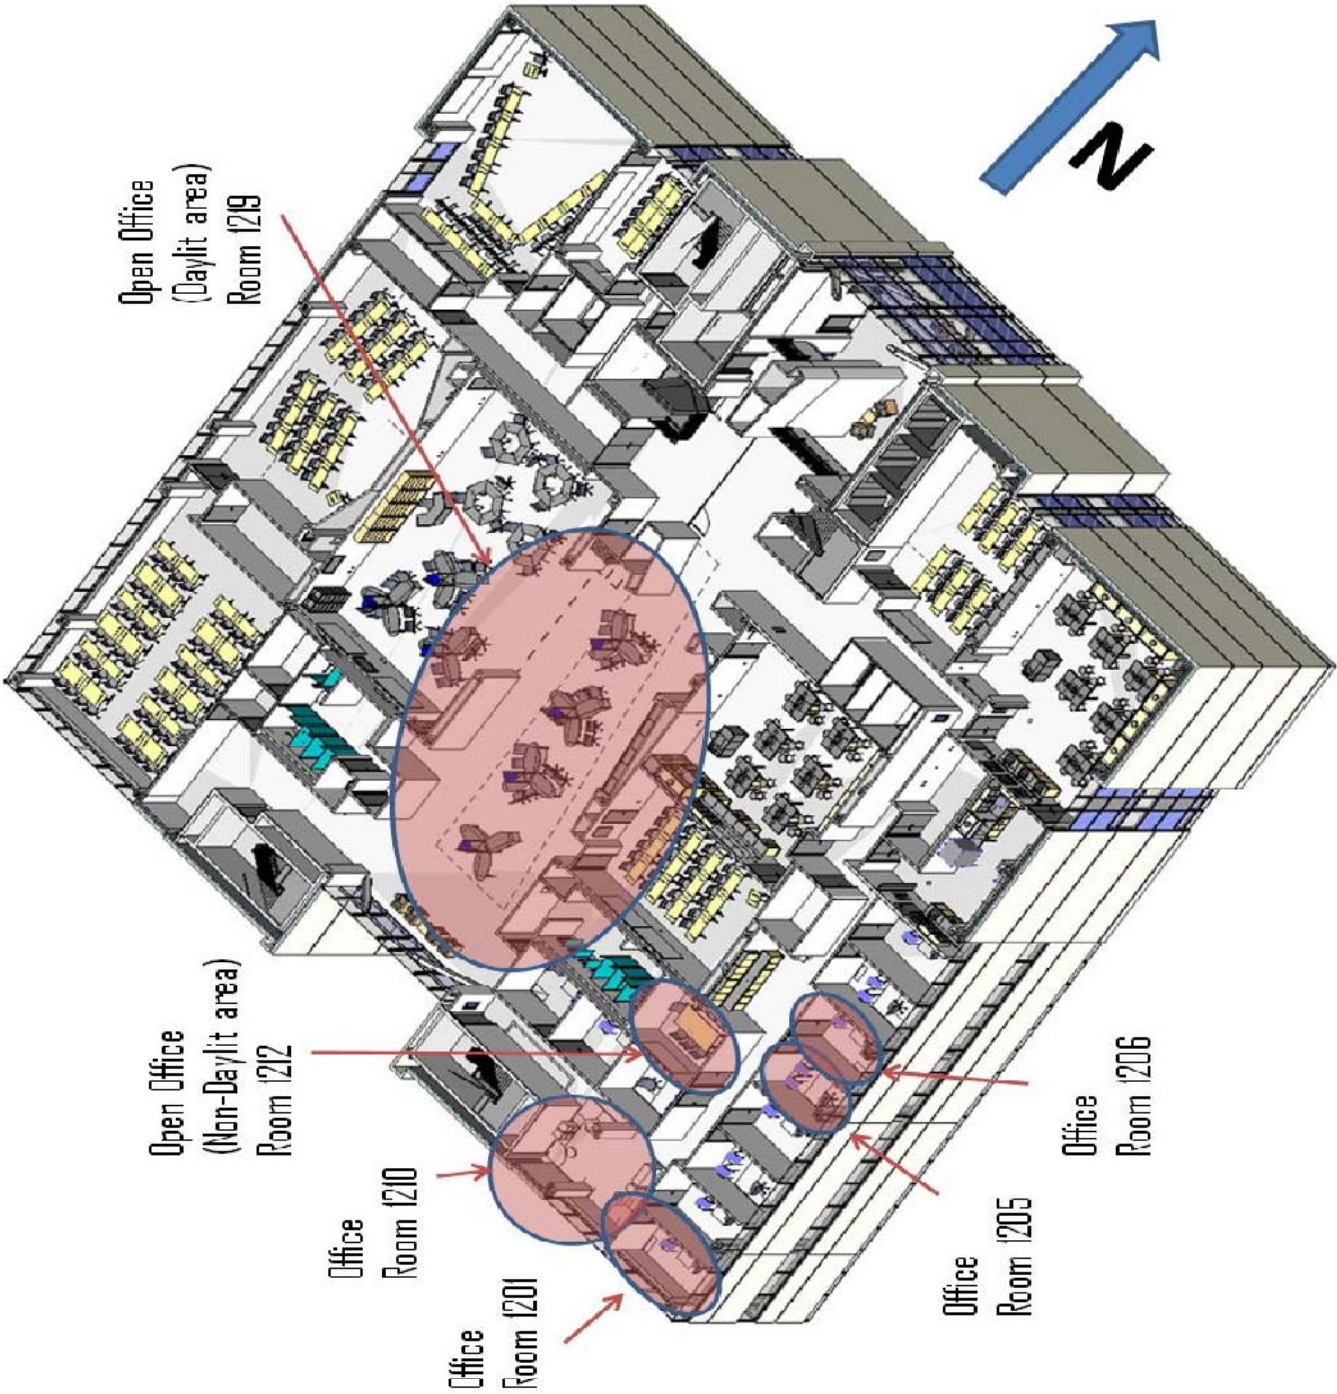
12th Floor Axonometric Plan Showing Rooms in Calculation
